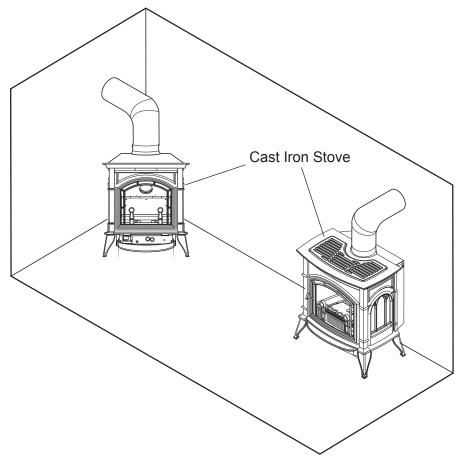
Example of Typical Installations (see "Clearances," page 9)
